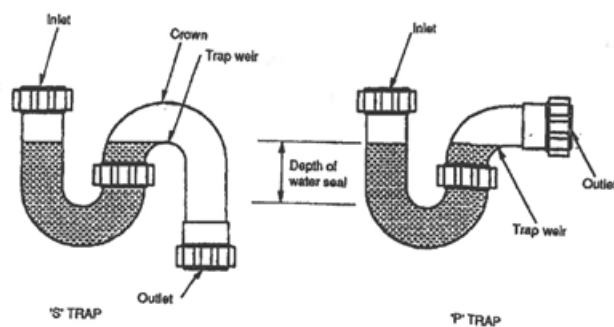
EXAMPLES OF FIXTURE TRAPS
